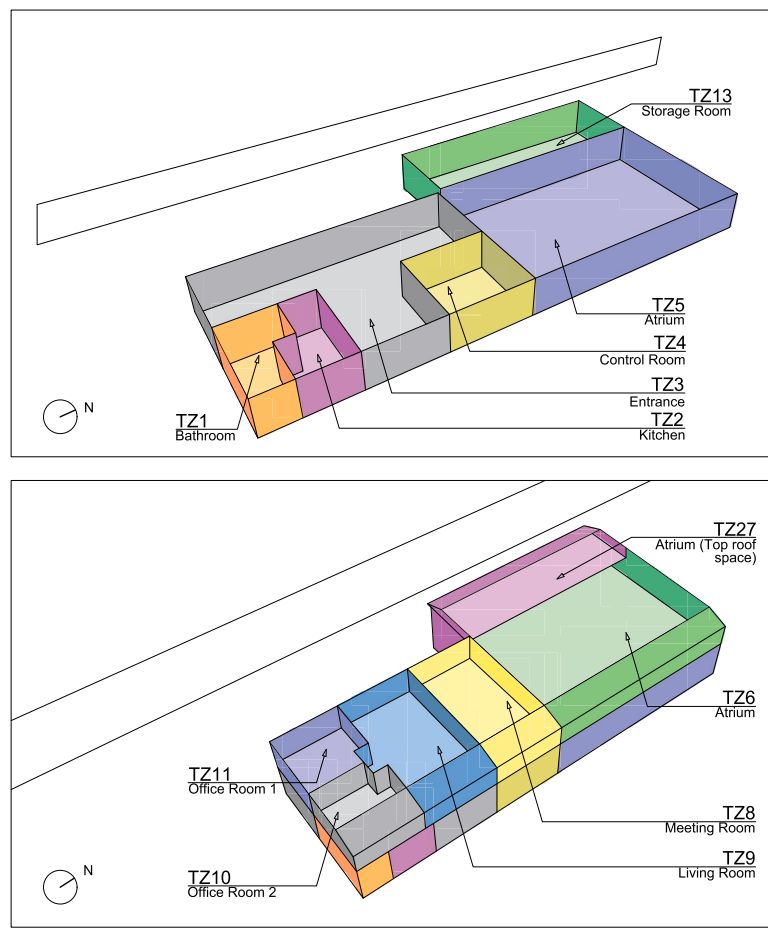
Building thermal zone: Ground Floor Plan (Top). First Floor Plan (Bottom) [36].
